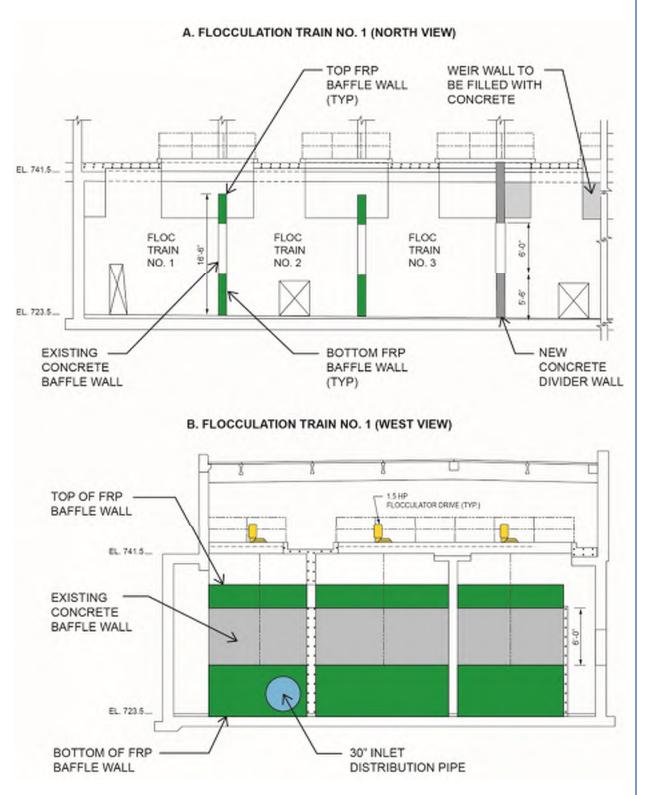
Modified East Flocculation Basin Layout Section Views
